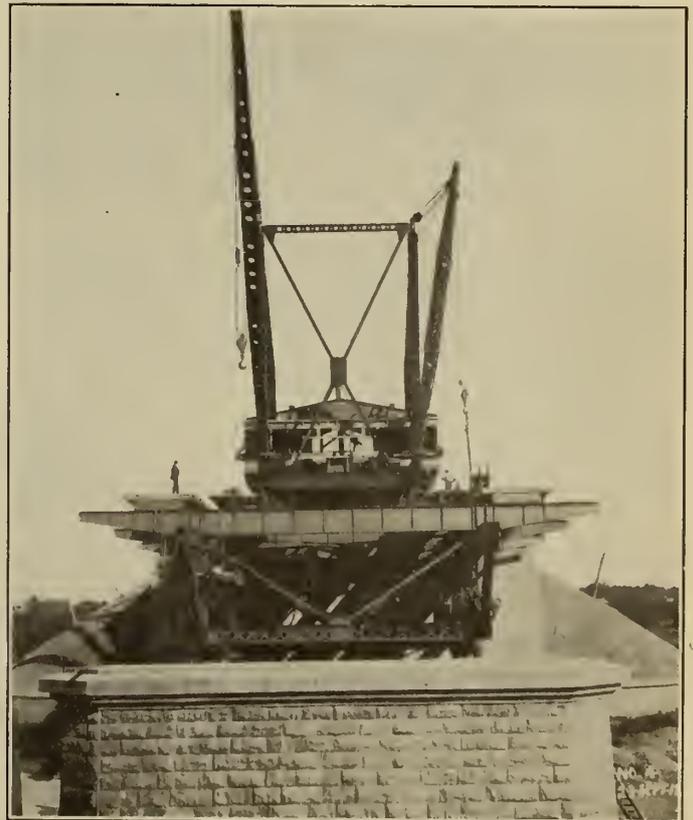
South Approach—Front View of Traveller No. 1 showing Arrangement of Deck.
